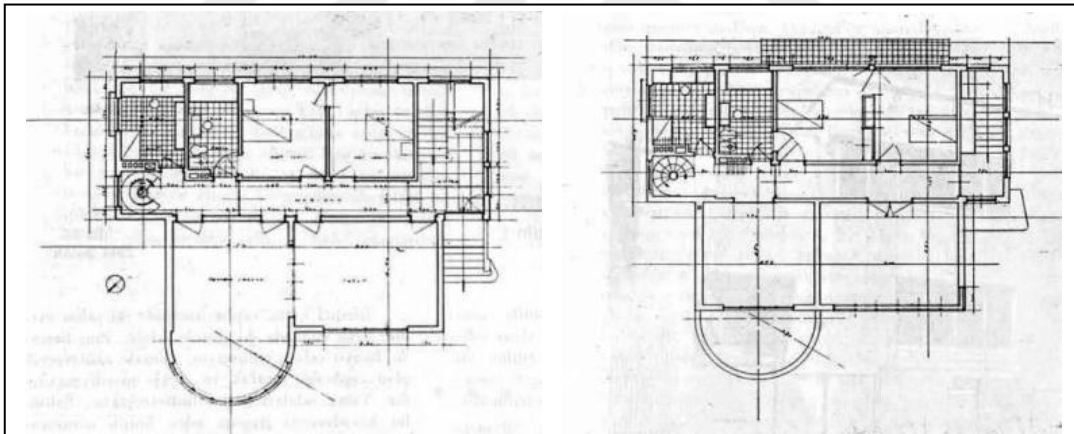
Floor plans of dr. Sani Yaver villa's [61]
